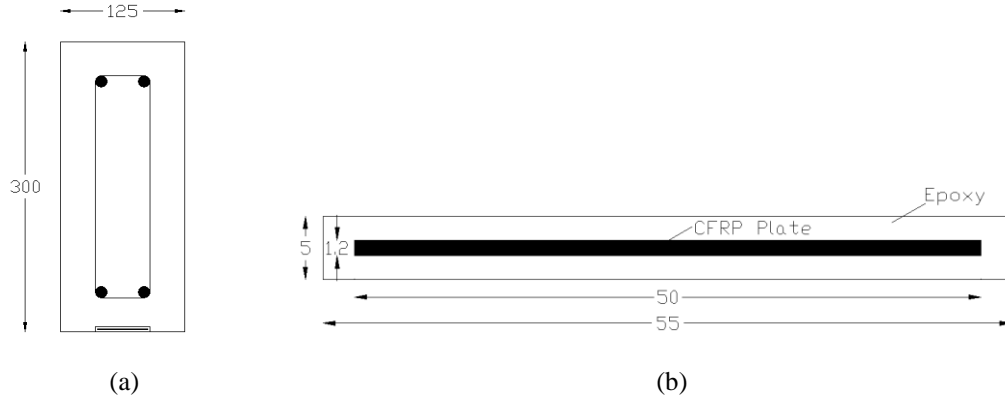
Cross-sectional area and dimension for horizontal positioning CFRP plate (all units are in mm).
